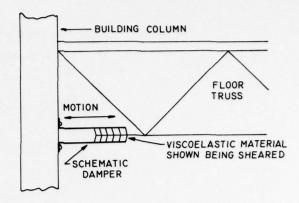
Location of Viscoelastic Shear Damper in a Floor Truss
